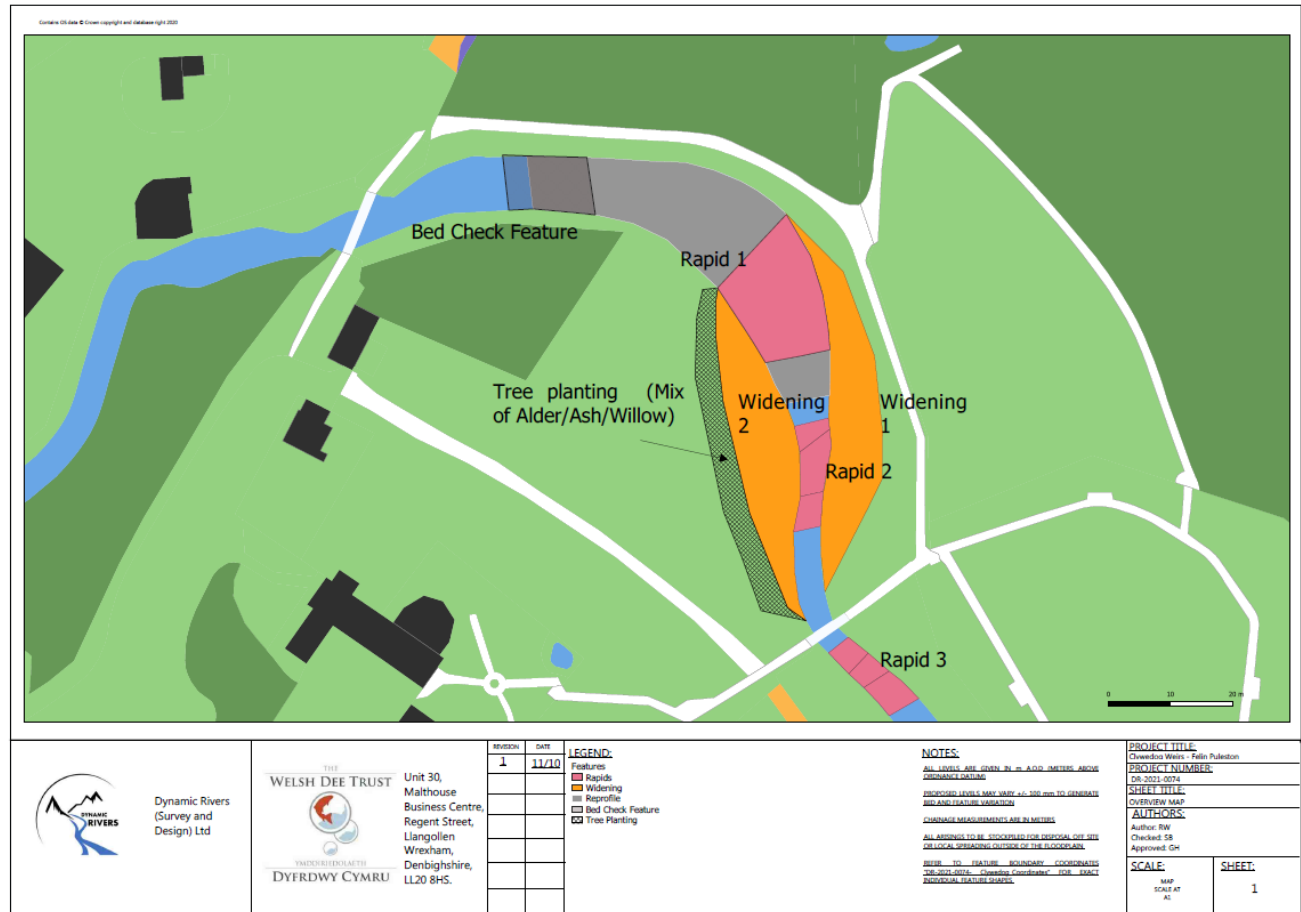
Final design for the Felin Puleston Weir removal scheme
